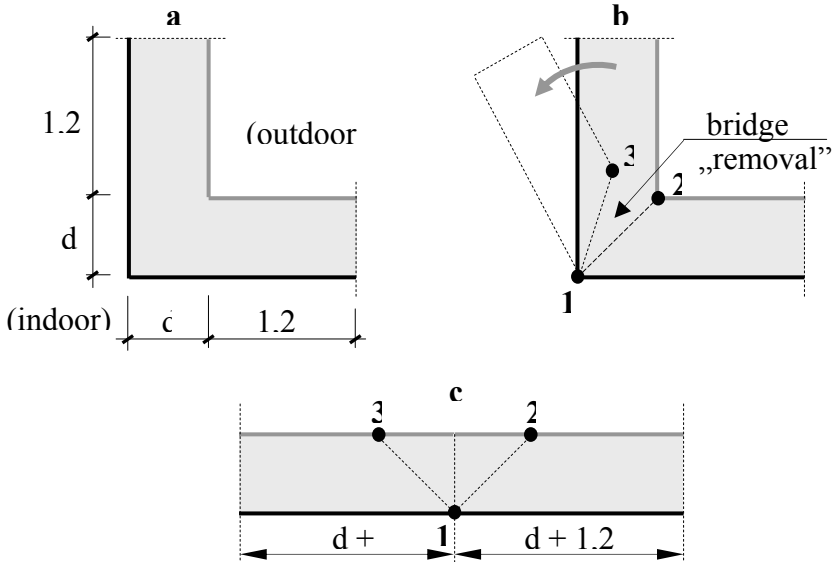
Thermal bridge situated at the intersection of two exterior walls – inner corner
